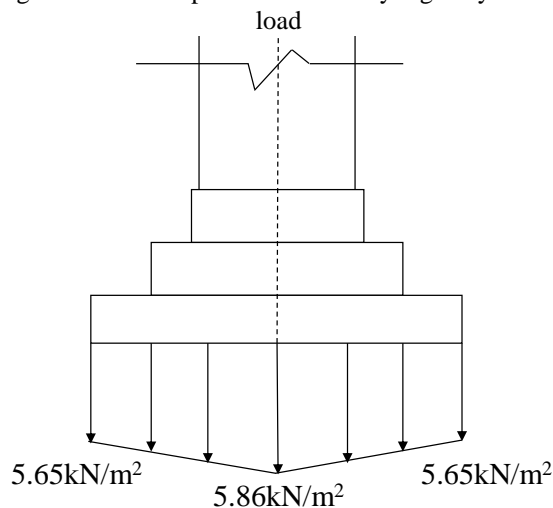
Equivalent trapezoidal distributed load of highway traffic load
